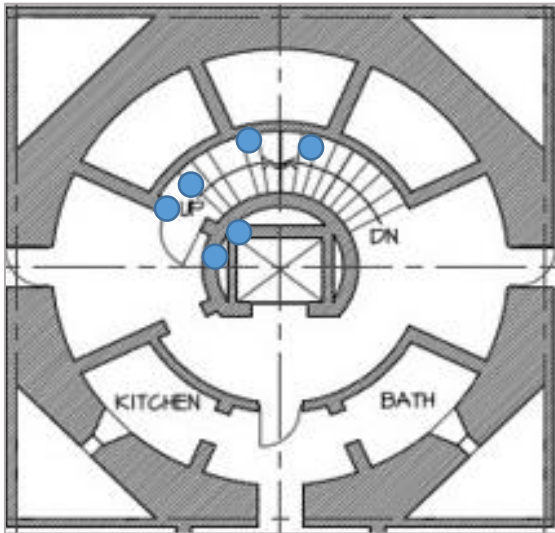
Location of observed efflorescence and other damages on the *Powell Street* mural.
